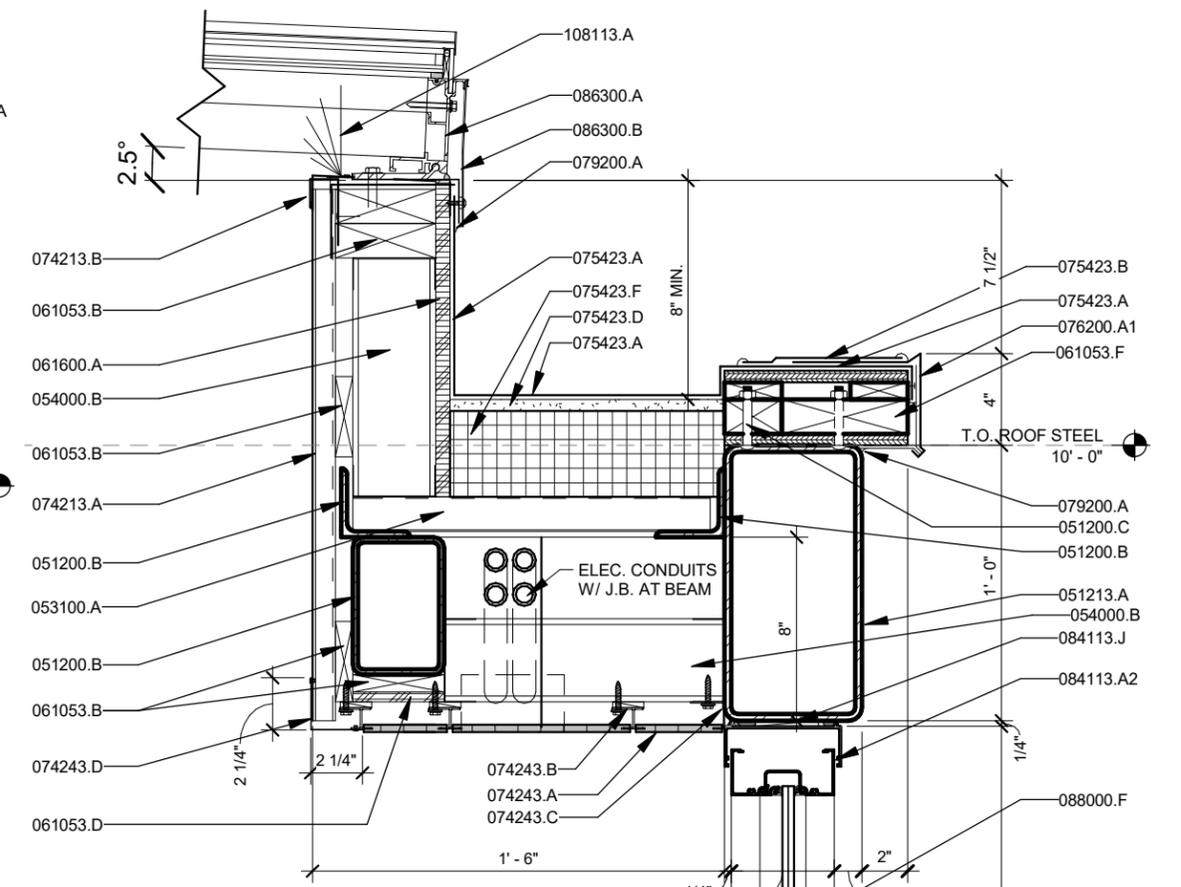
DETAIL - CANOPY EDGE AND SKYLIGHT HEAD
